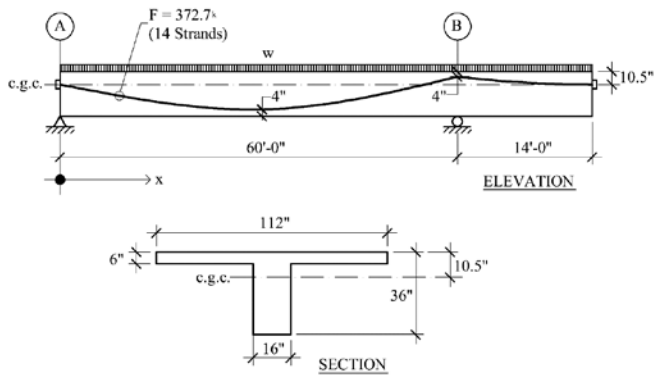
Beam section dimensions (c.g.c. indicates center of gravity of the gross concrete section) and tendon location (parabolic tendon profile)
